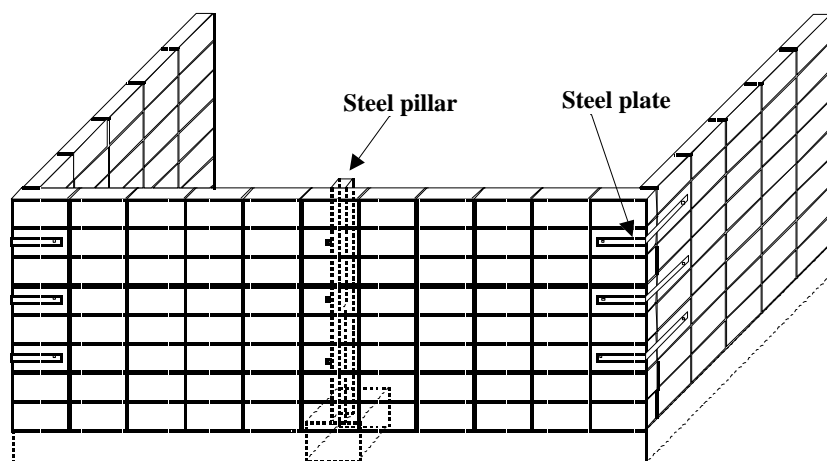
An example of strengthening method by connecting masonry wall to intersecting walls
